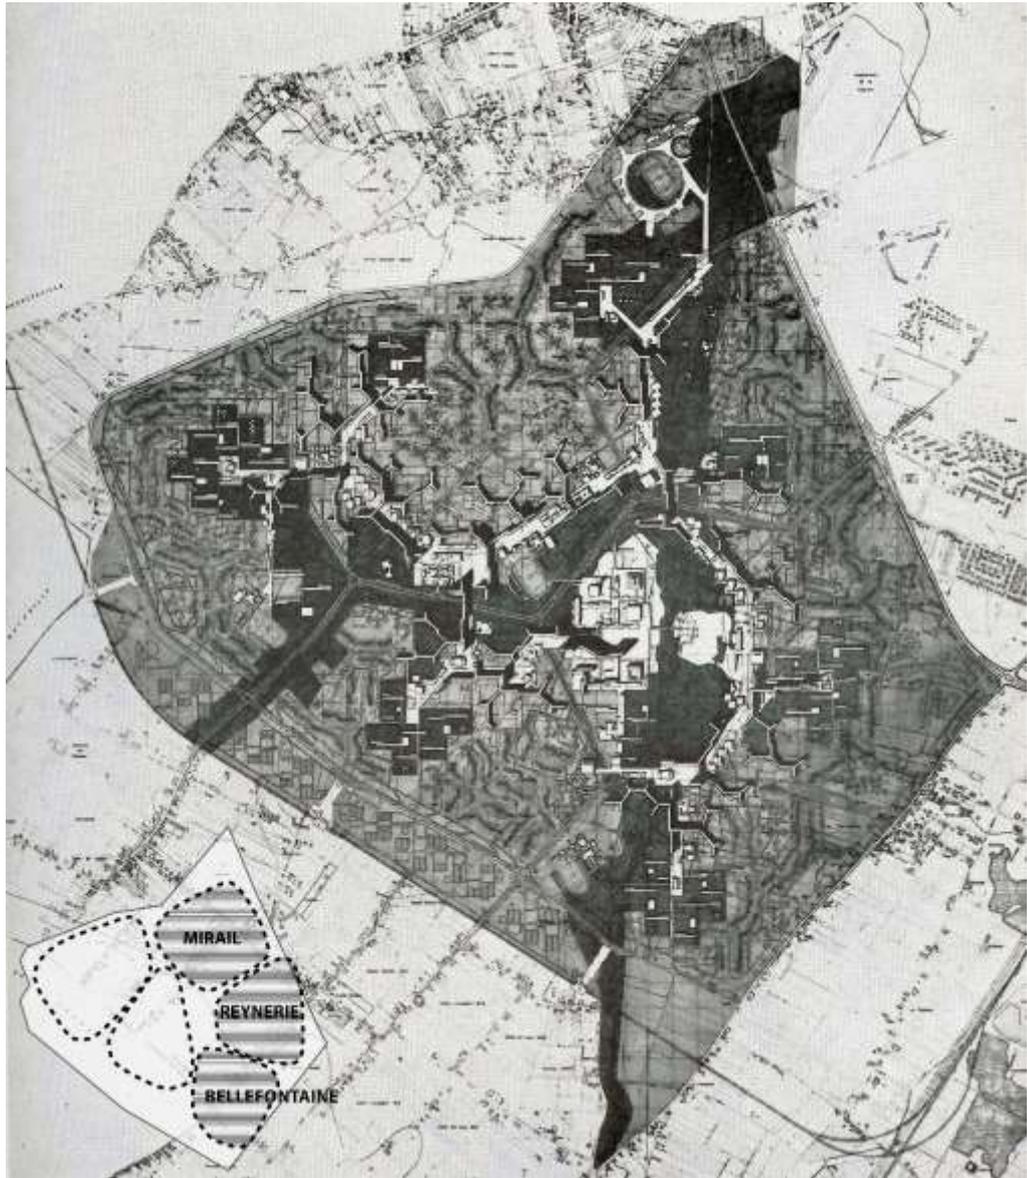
Proposed development plan of Toulouse-Le Mirail
